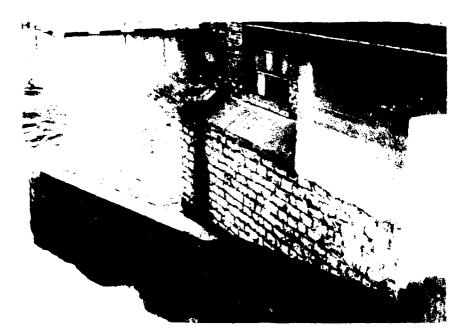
Taken from right spillway, looking at downstream portion of right abutment and masonry foundation wall of Kimberly Clarke plant
